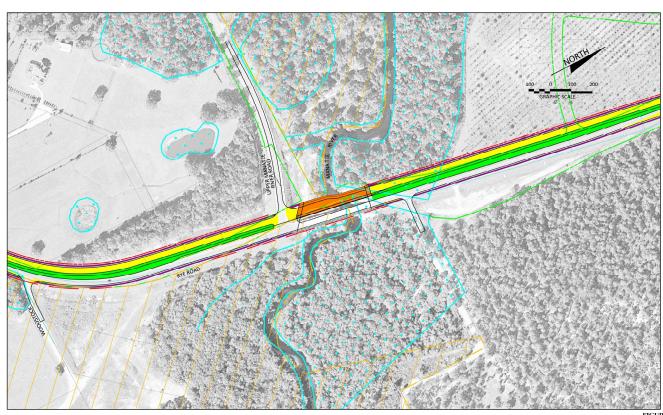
RYE ROAD ALTERNATIVE CONCEPTUAL PLAN VIEW OF BRIDGE AND APPROACHES
